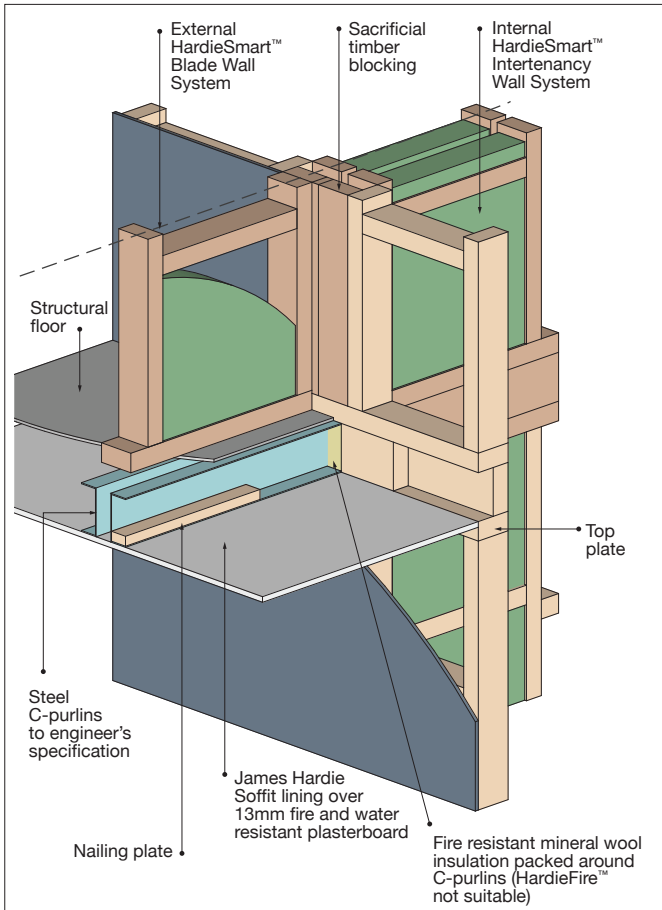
A HARDIESMART™ BLADE WALL SEPARATING CANTILEVERED BALCONY, OVER APPURTENANT CLASS 10A CARPORT BELOW
